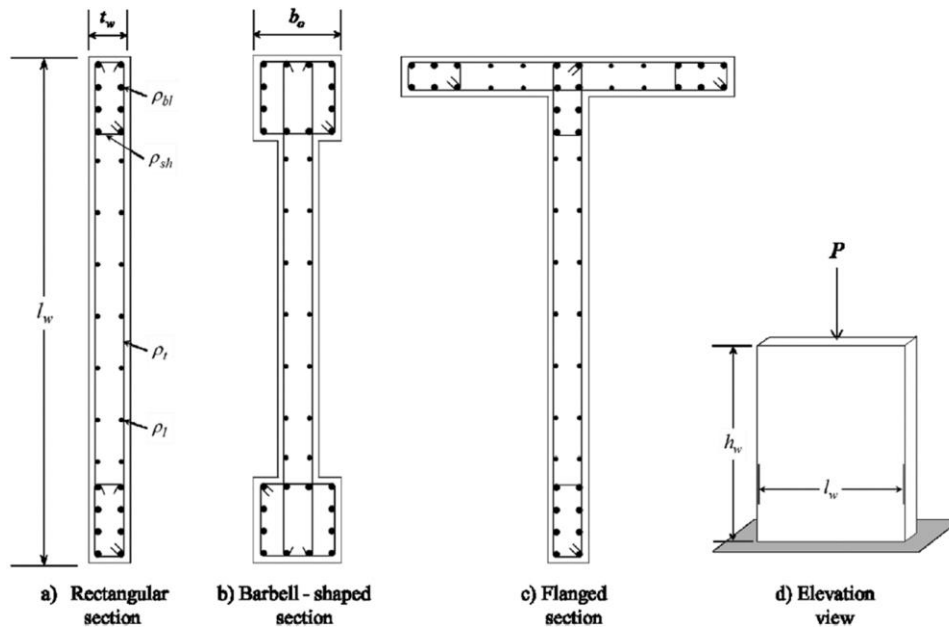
Geometrical properties reinforcement regions of reinforced concrete shear wall specimens
